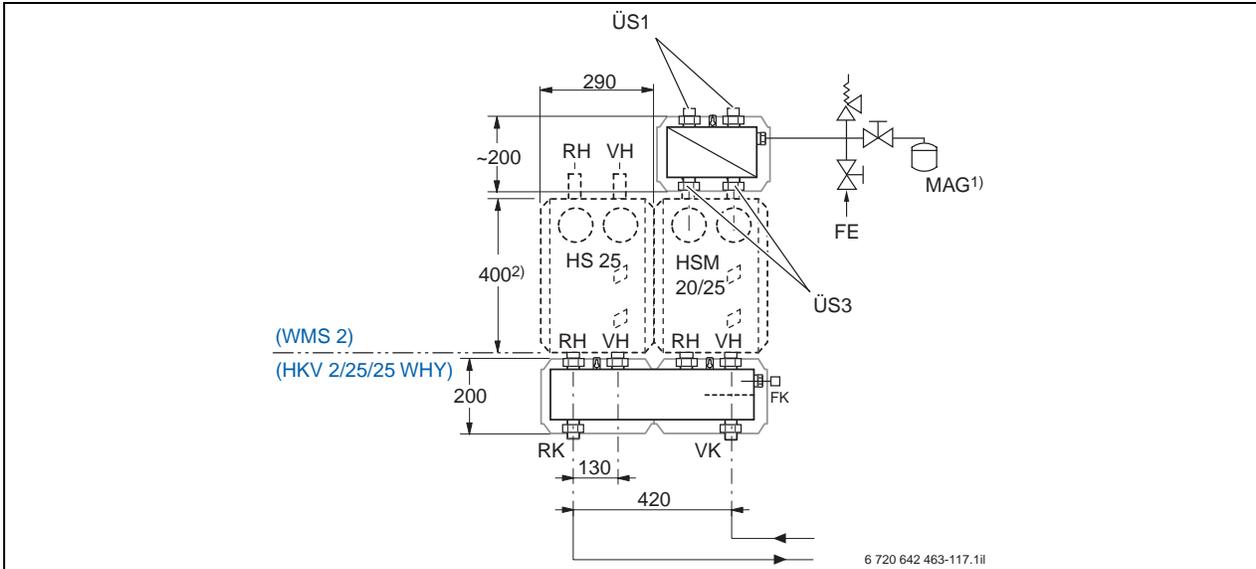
Dimensions of the system separation set heating circuit distributor DN25 with integral low loss header for two heating circuits (dim. in mm)
